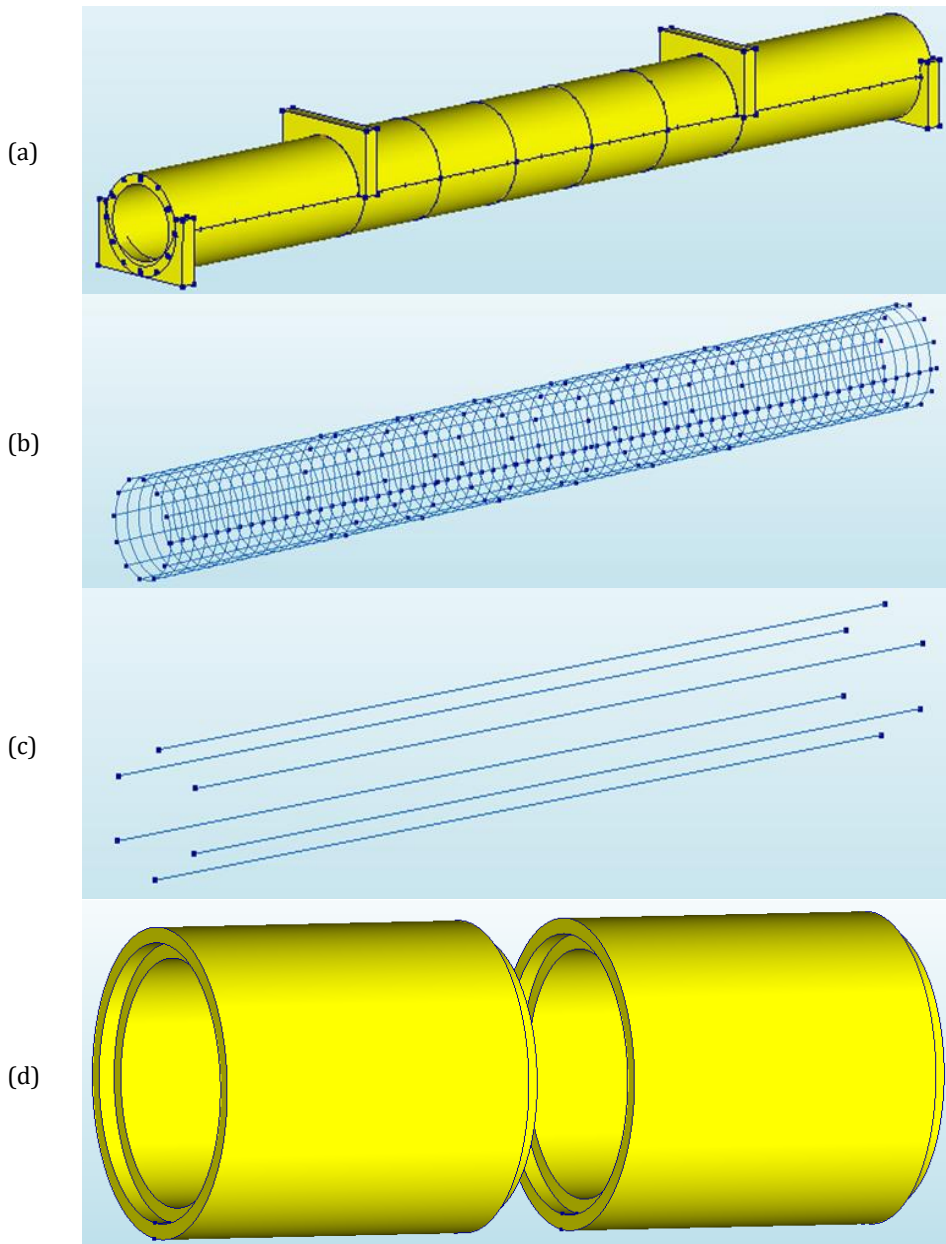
The FE model of circular hollow SPT beams: (a) circular beam with support and loading plates, (b) Longitudinal and hooped reinforcements, and (c) post-tensioned tendons, (d) segmental joint details
